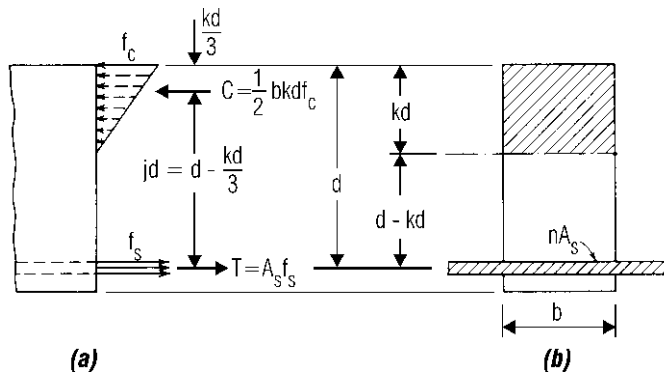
Rectangular concrete beam reinforced for tension only: (a) In working-stress design, a linear distribution is assumed for compression stresses. (b) Transformed all-concrete section.
